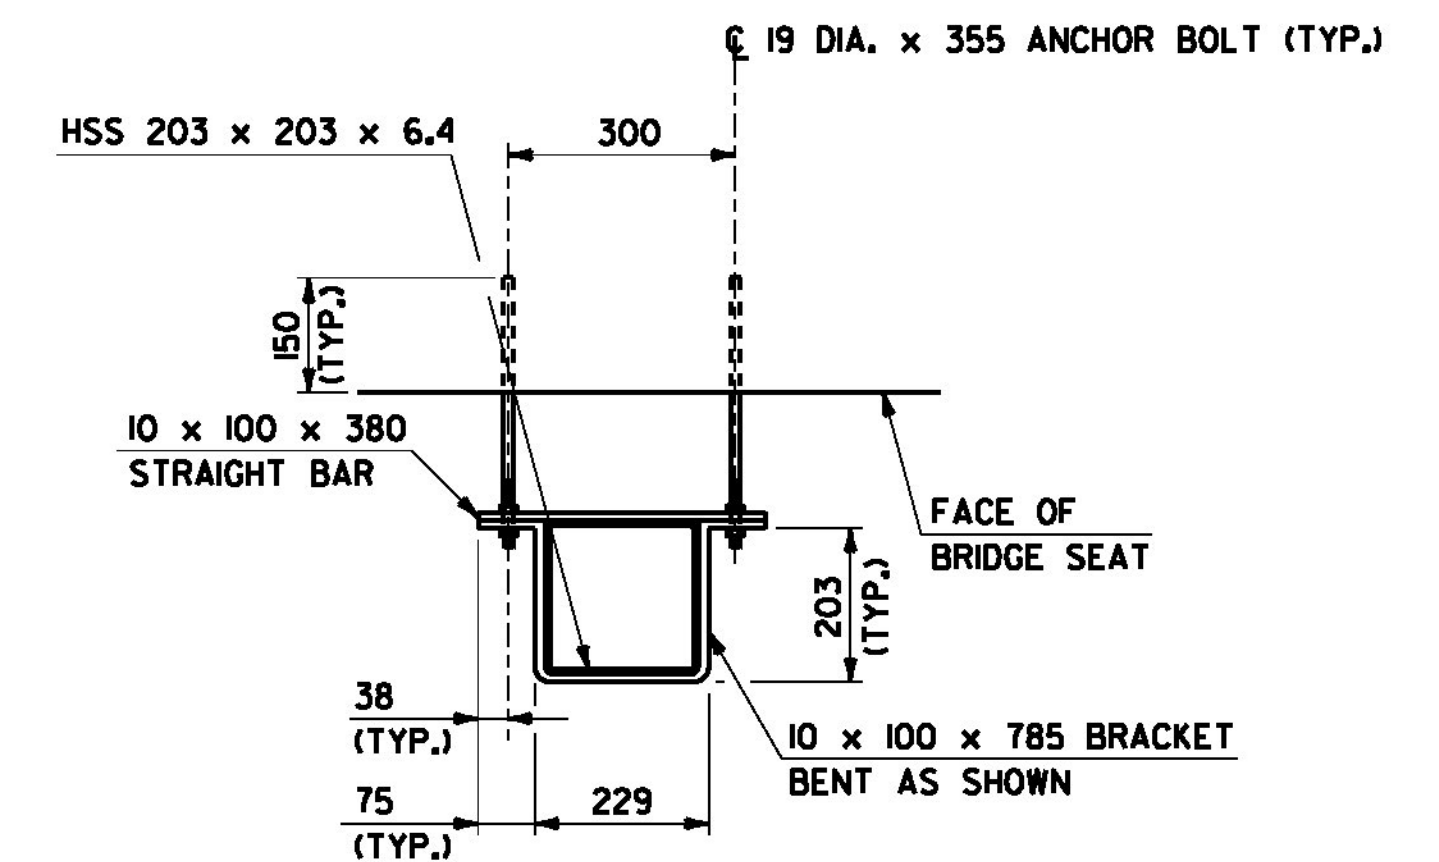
DETAIL FOR ATTACHING DOWNSPOUT TO BACKWALL
